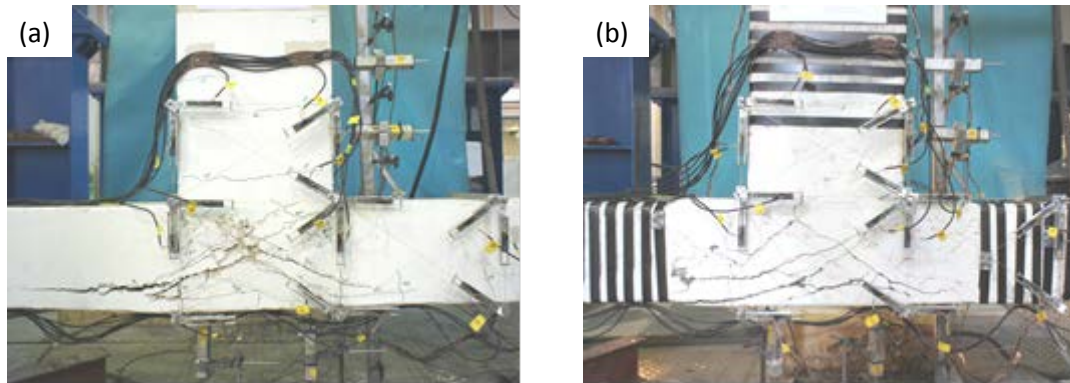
Typical failure modes of joints (a) JB-2, and (b) JB-2R, face A
